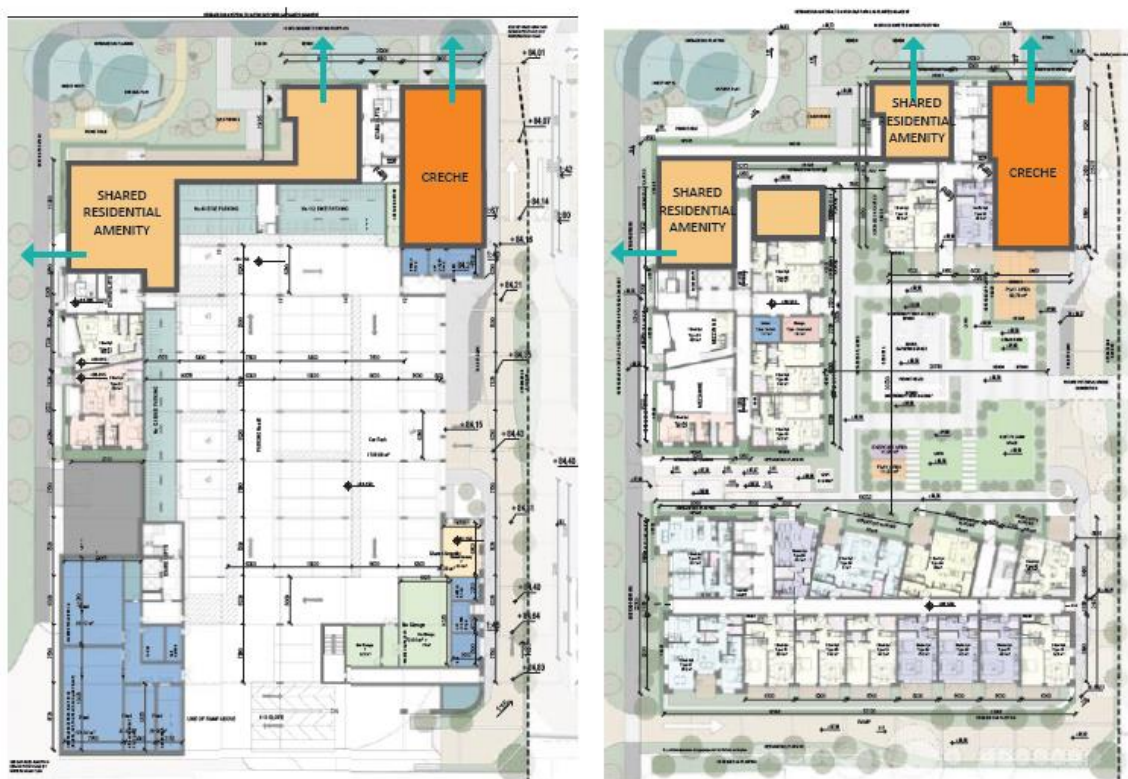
Illustration of location of Shared Amenity Spaces and Creche at Lower Ground and Ground levels from MDO Design Statement
